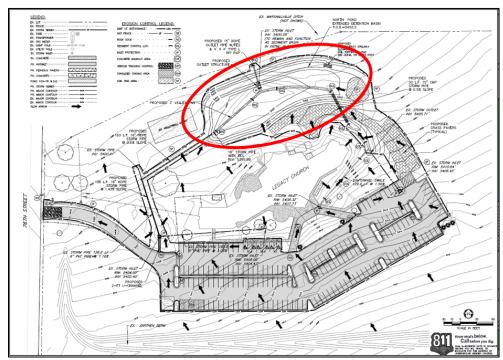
October 2023 drainage plan, with detention pond location indicated in red.
